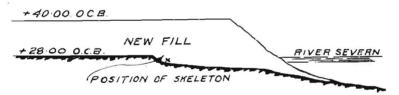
O.C.B. = Old Cumberland Basin Datum.
